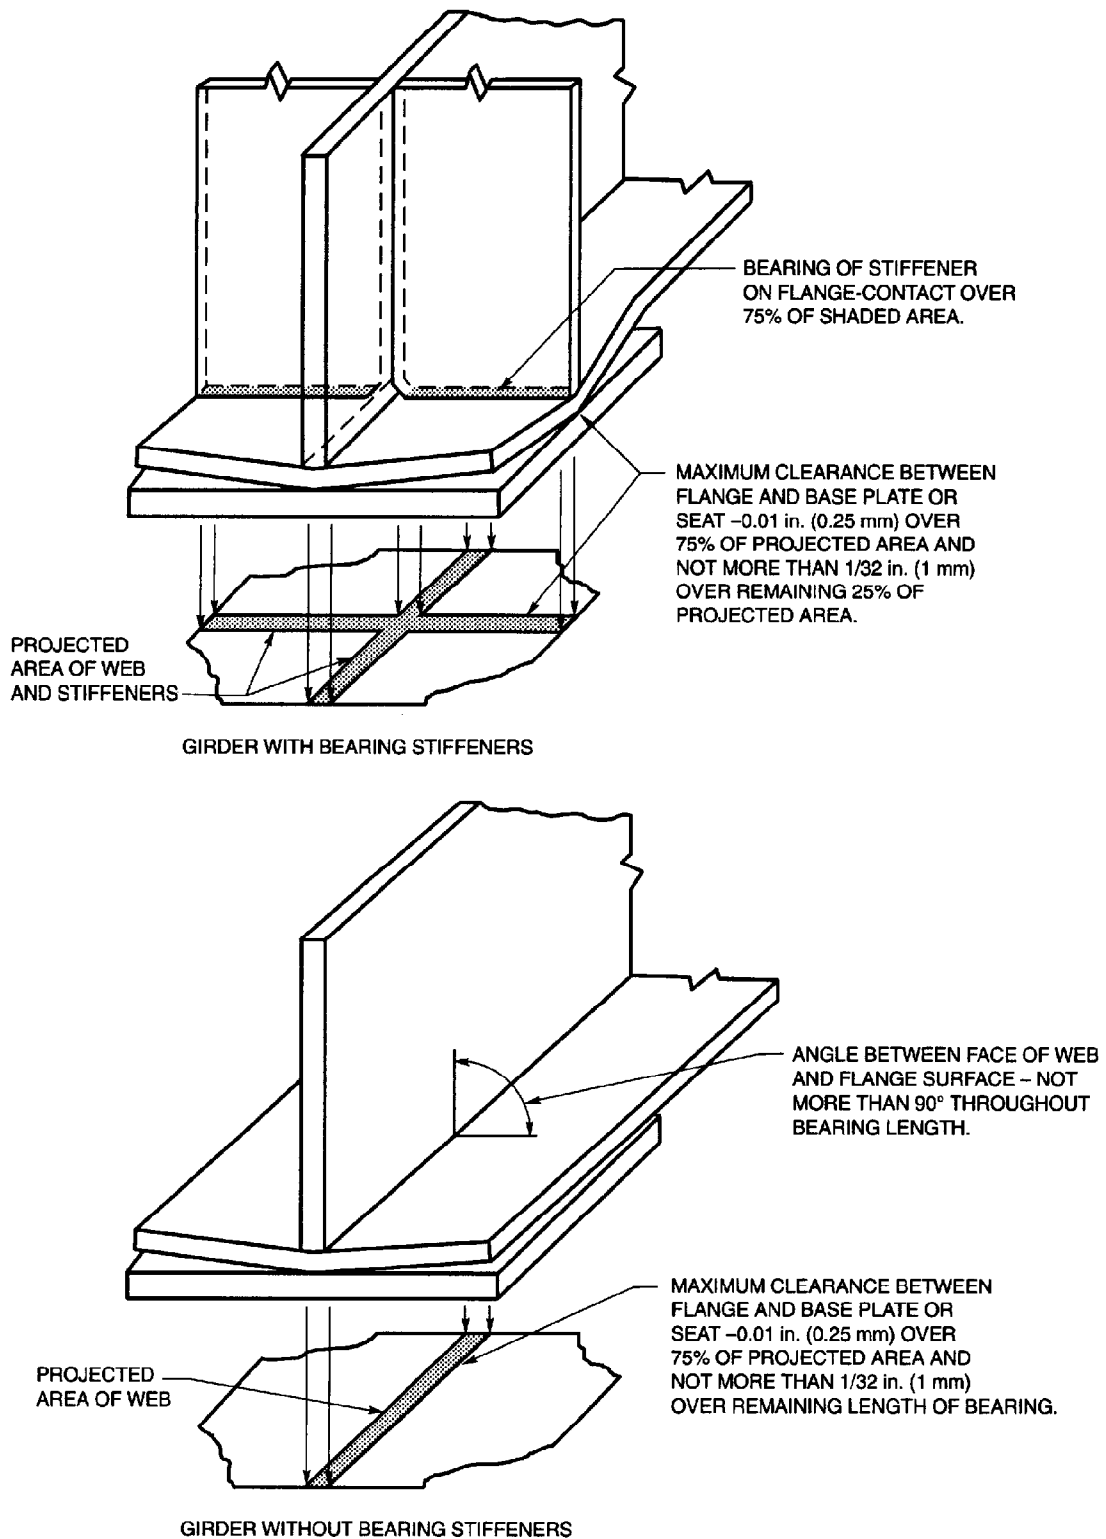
Tolerances Bearing Points (see C5.23.10)
